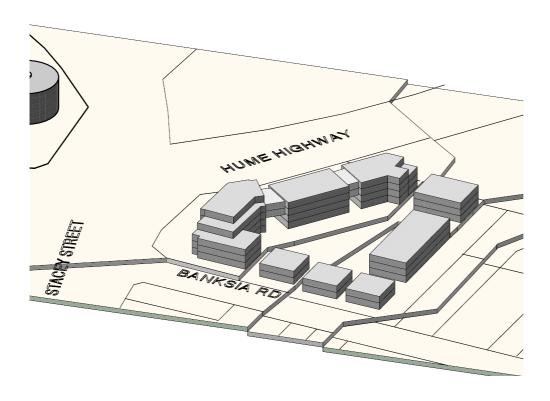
Proposed building envelope for development on the consolidated site as viewed from Banksia Road at the rear (not to scale)
